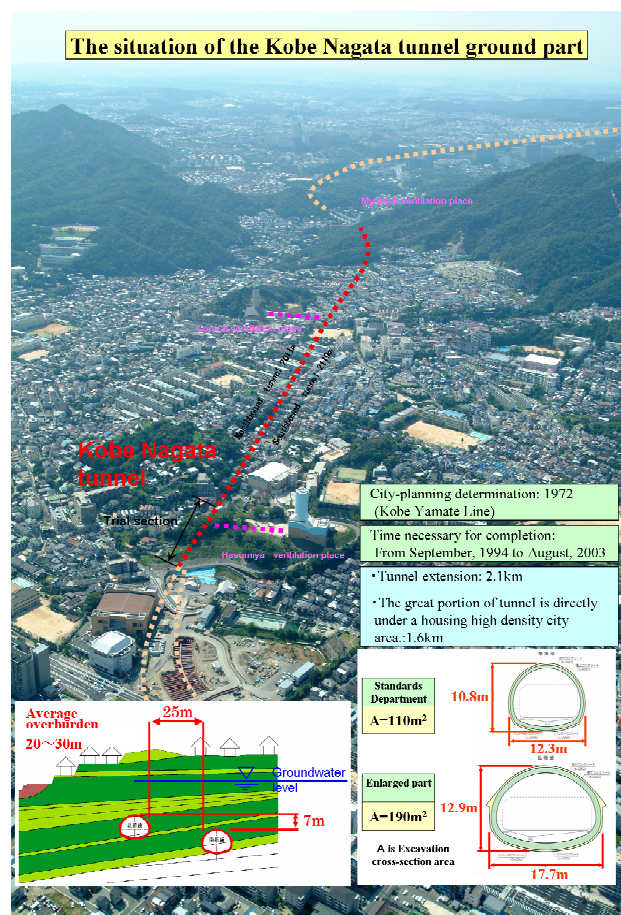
aerial-view, excavation cross section, longitudinal section and cross section
